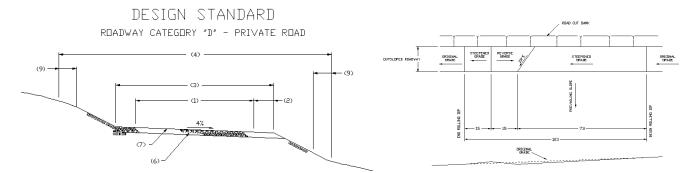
5C's Low Impact to Road Hydrology (LITH) design standard drawings consistent with AASHTO Low Volume Road Standards. Left- outslope road segment and right, rolling dip segment.
